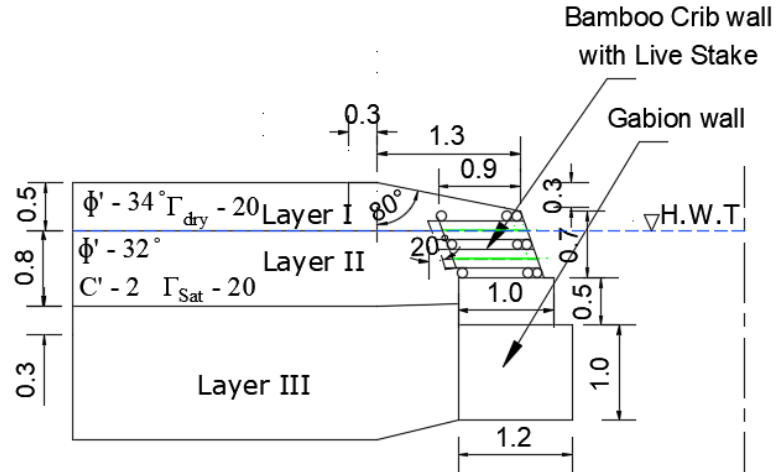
Proposed idealized section of Bamboo Crib wall
